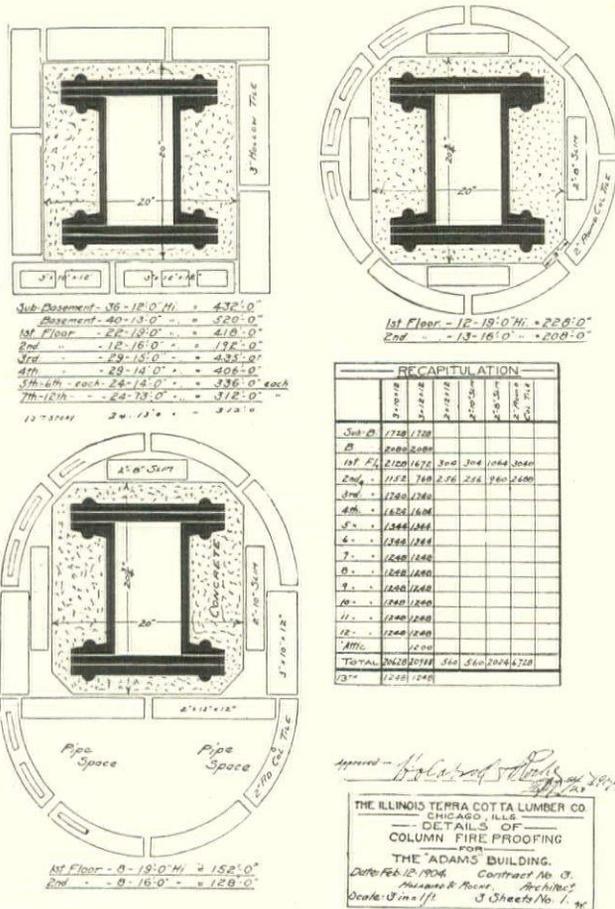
SECTIONS SHOWING CHANNEL-AND-PLATE STEEL STANCHIONS AND METHODS OF FIREPROOFING STEEL IN THE ADAMS (NOW REPUBLIC) BUILDING, CHICAGO.
